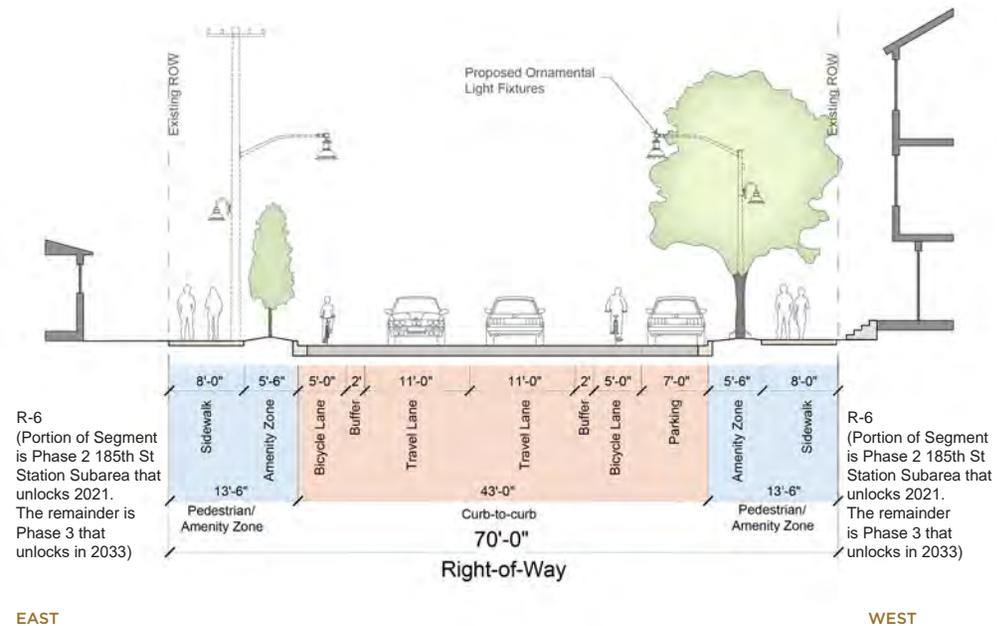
10th Avenue: Recommended section from 180th to 175th St
